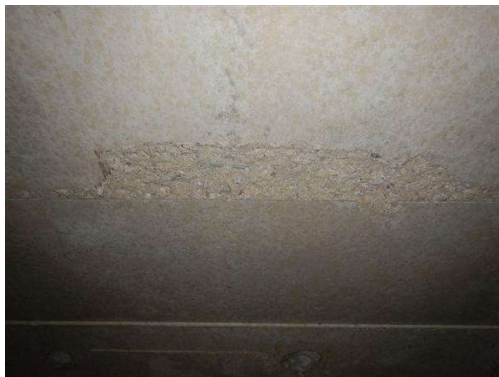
Spall (30"x6"x0.5") on the top flange/ceiling in Span 16SB
